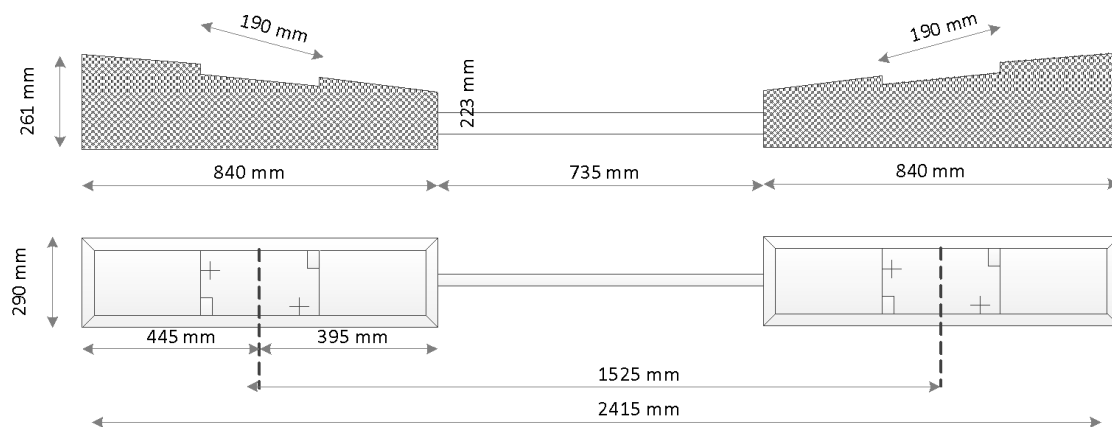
TWIN-BLOCK REINFORCED-CONCRETE SLEEPER U41 OF THE FRENCH RAILWAYS (PROFILLIS, 2000)
